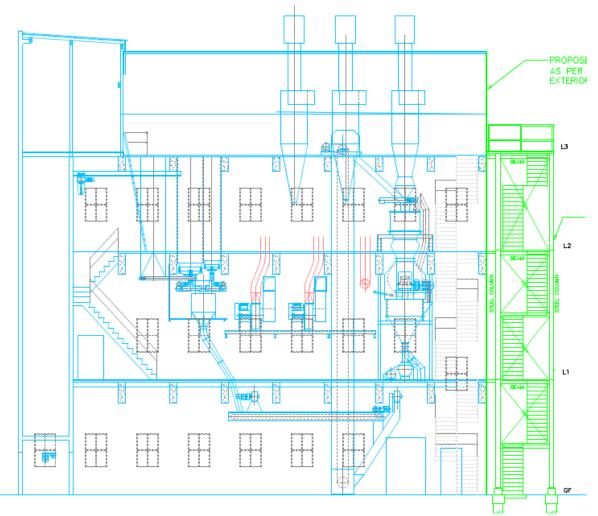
Extract of the proposed elevation in DA2018/121/2.
